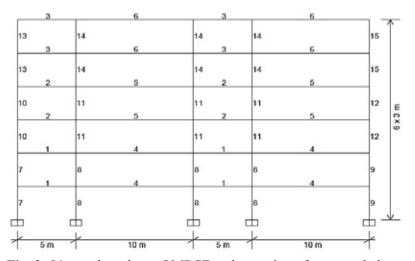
54-member planar OMRSF and grouping of structural elements
